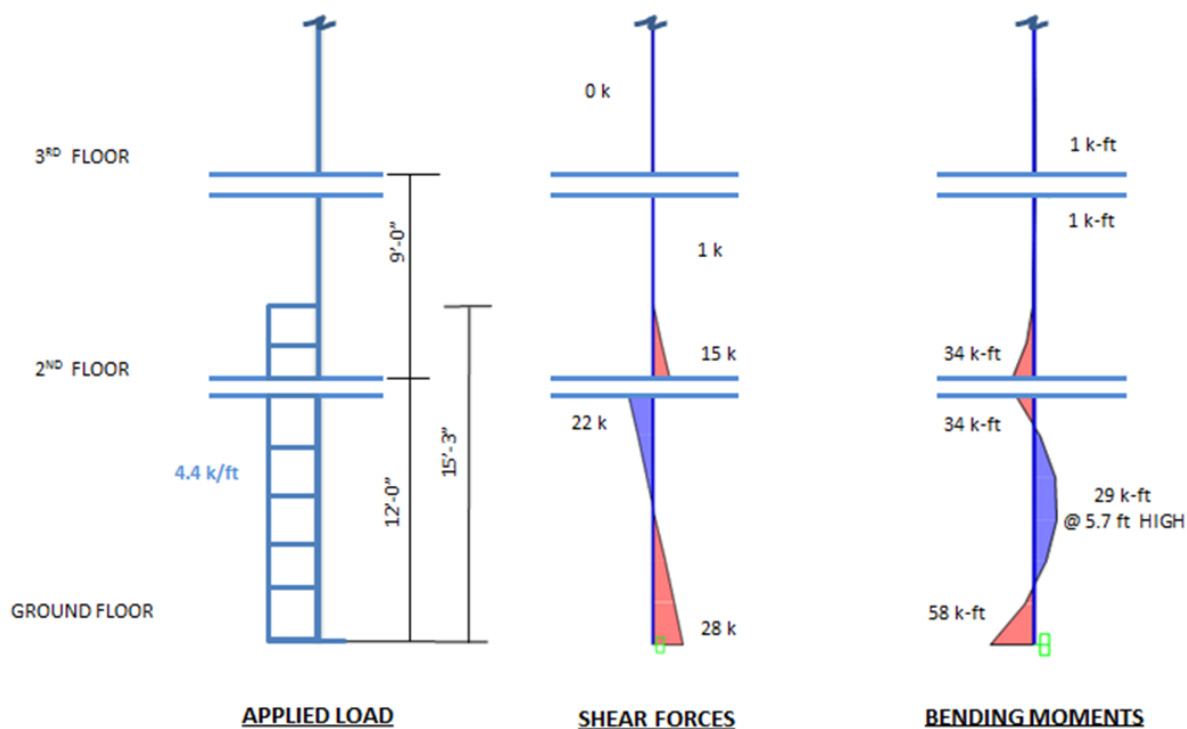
Hydrodynamic loading on interior column of Waikiki residential building due to Load Case 2
